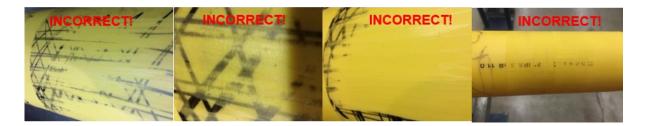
Figure X-p - Incorrect Scraping! Improper surface preparation / Not enough material removed, marks still visible.
